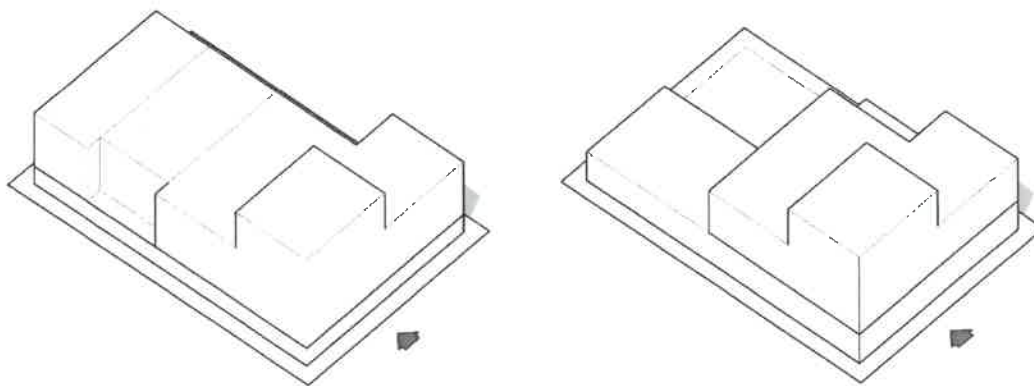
Building massings should have the largest massing oriented towards the primary street / corner
